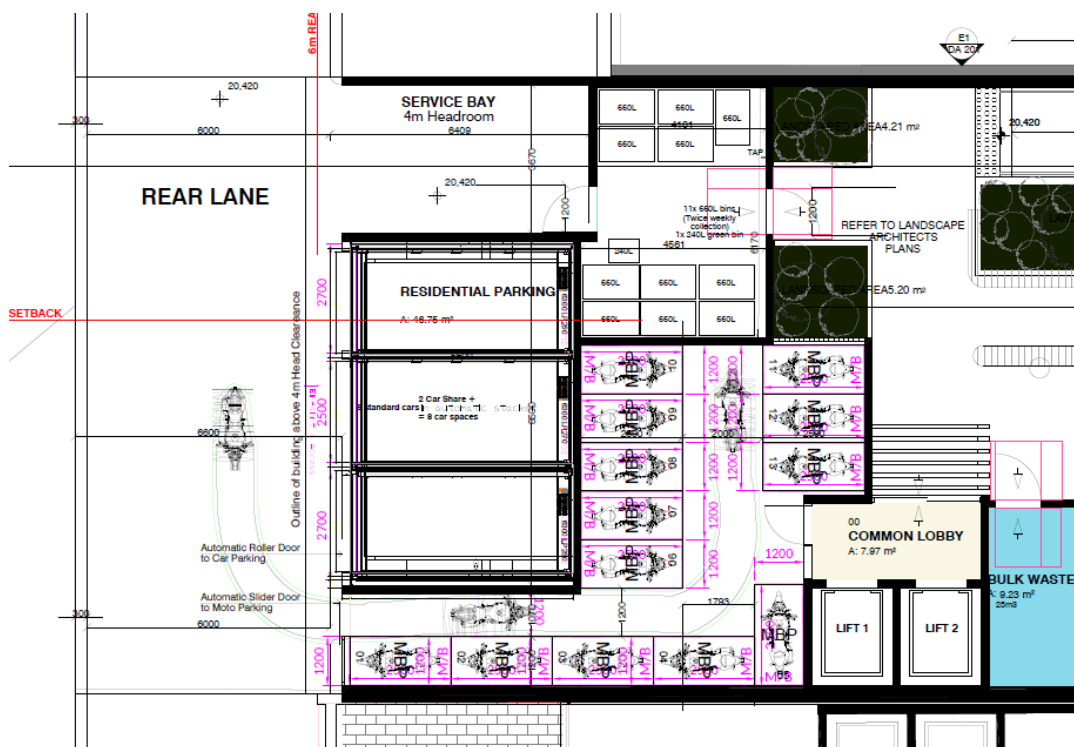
Architectural plan excerpt showing future rear access and parking configuration
